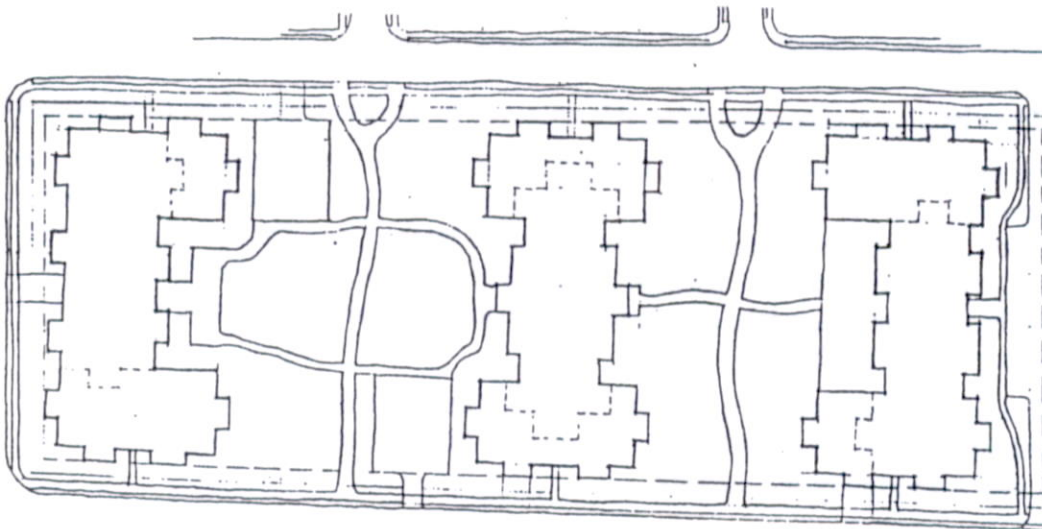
H.1: This larger residential site plan shows exemplary pedestrian connections, not only between the buildings on and site, but also linking to and extending adjacent streets.
